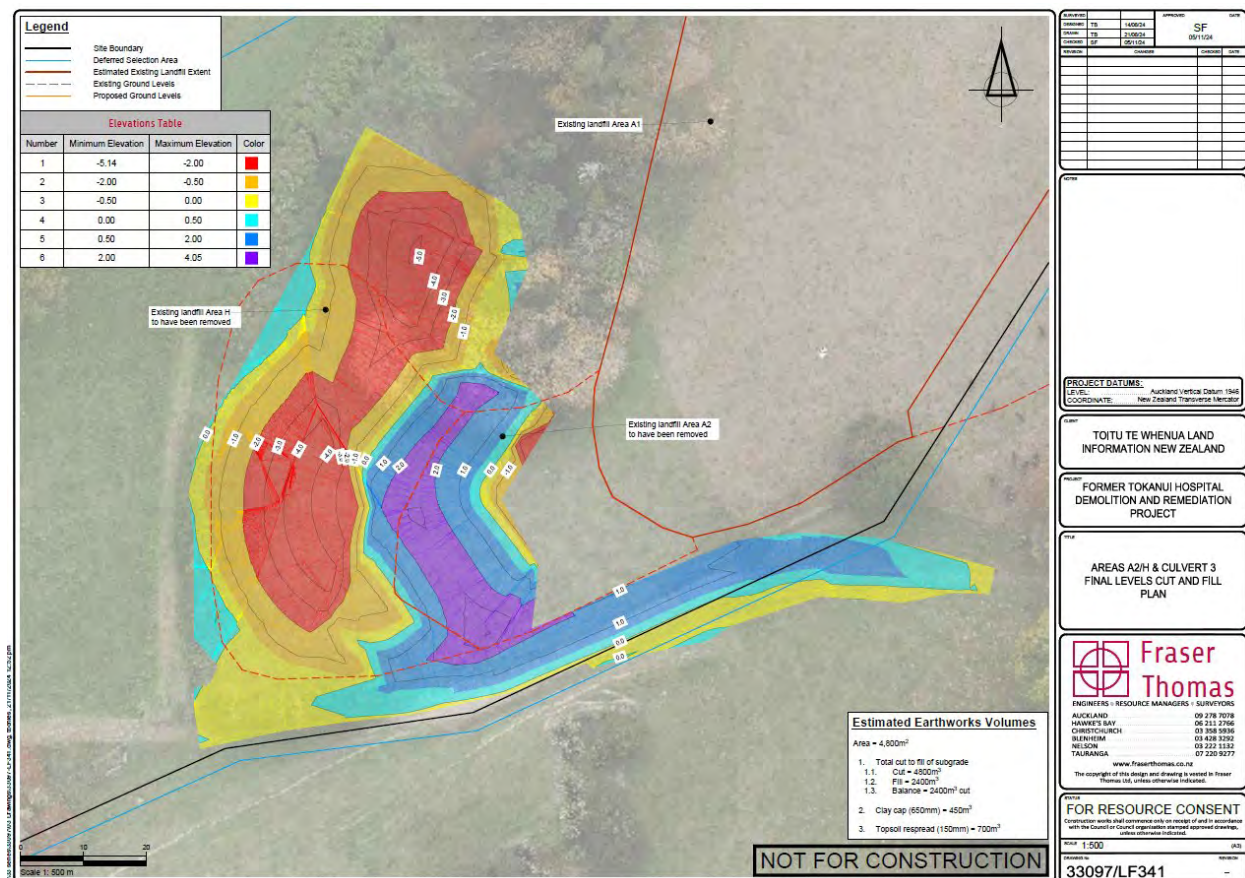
Areas A2H & Culvert 3 – Final Levels Cut and Fill Plan
